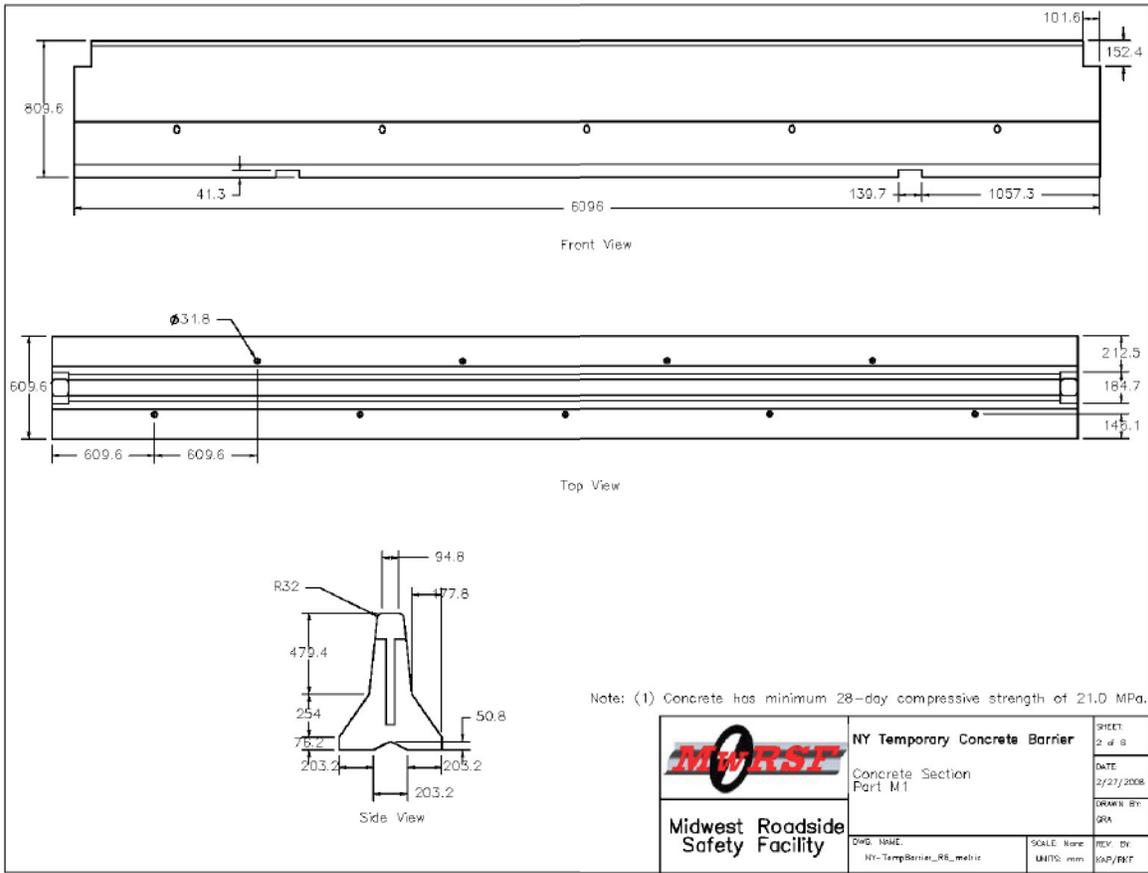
Temporary Concrete Barrier Details, Test NYTCB-2
